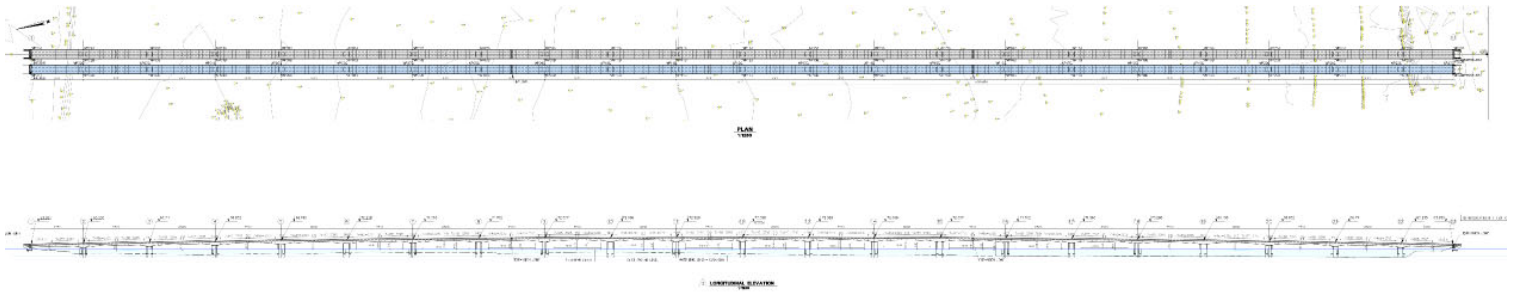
Bridge Plan and Elevation. Click on the image to open it in a higher resolution
